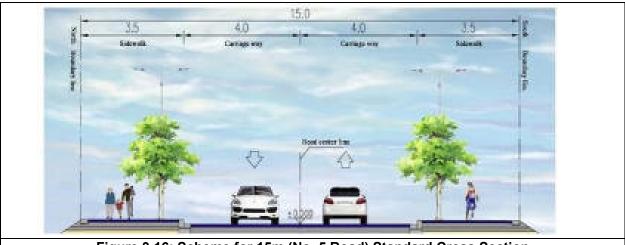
Scheme for 15m (No. 5 Road) Standard Cross Section
